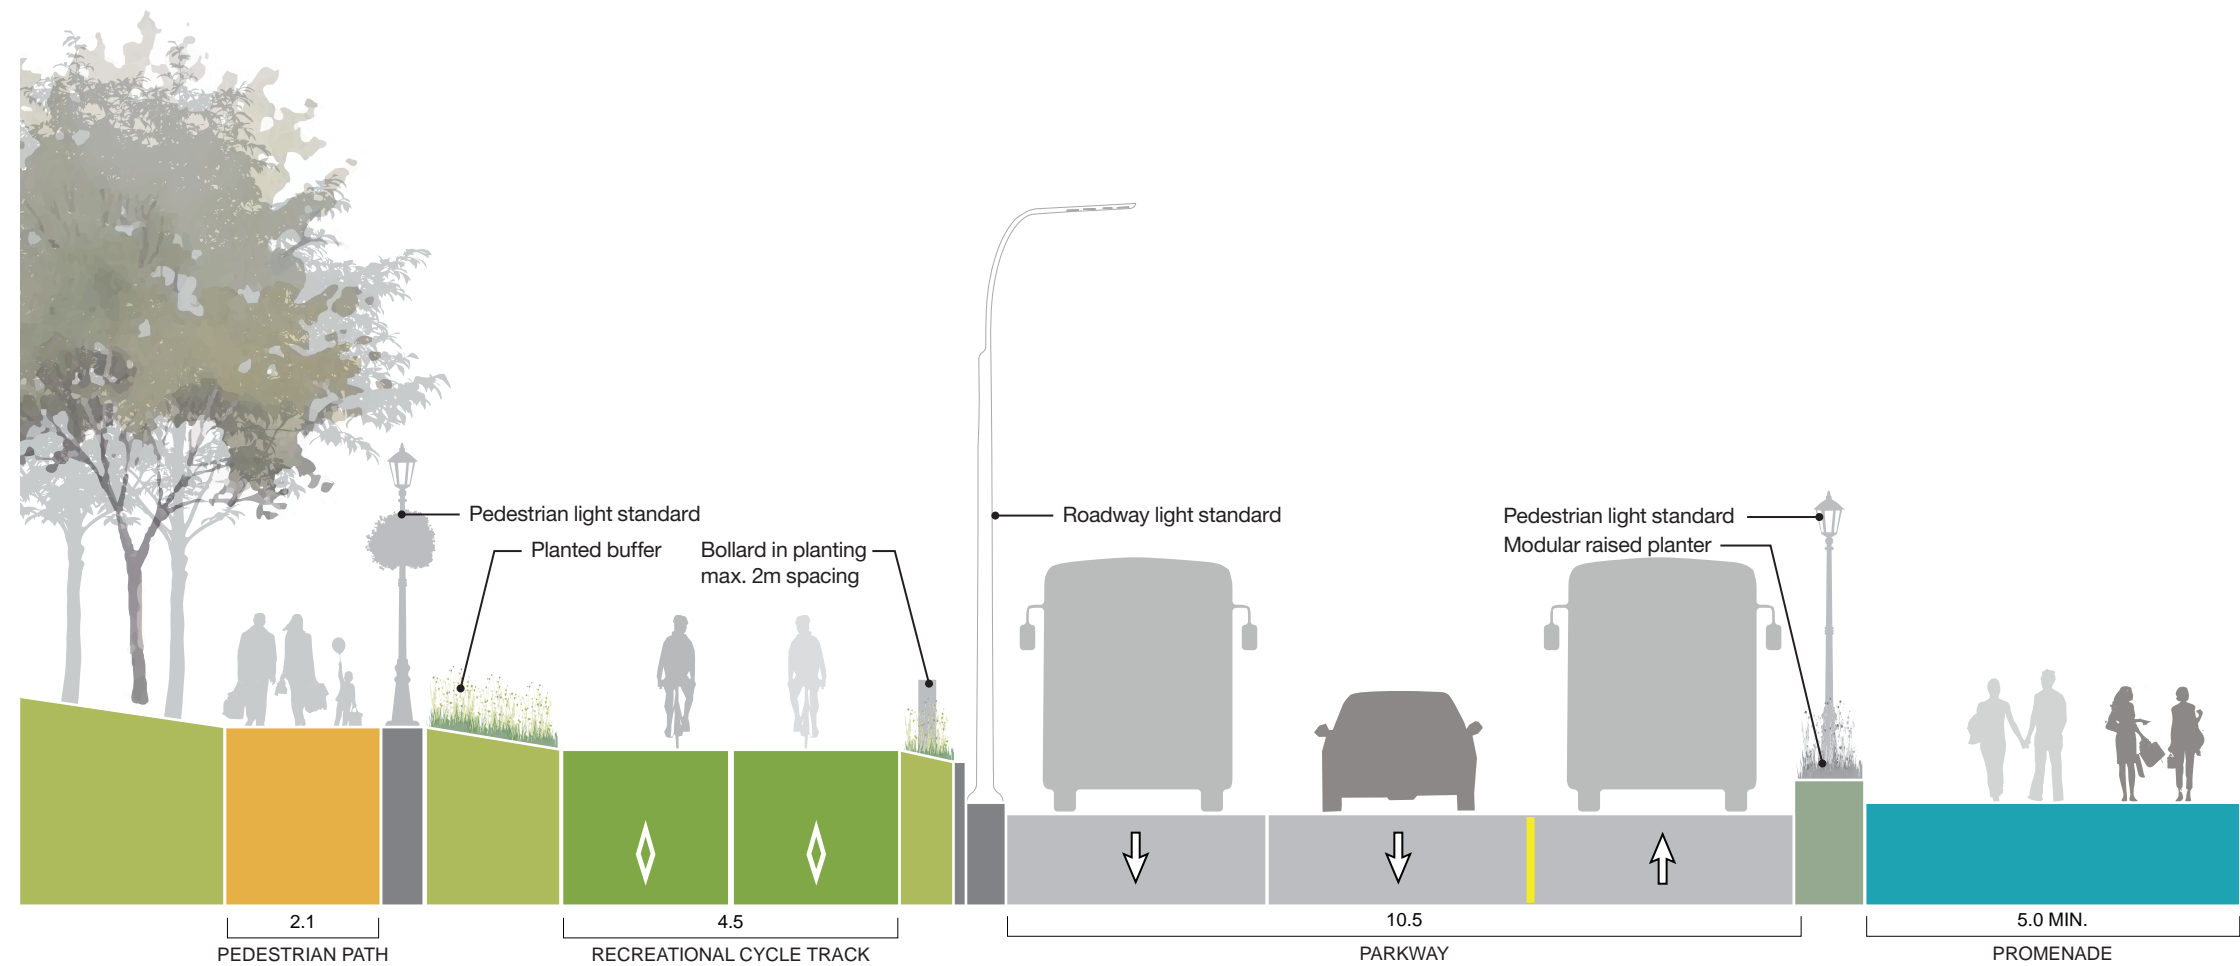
Parkway Section D1: South of Illumination - looking northward
